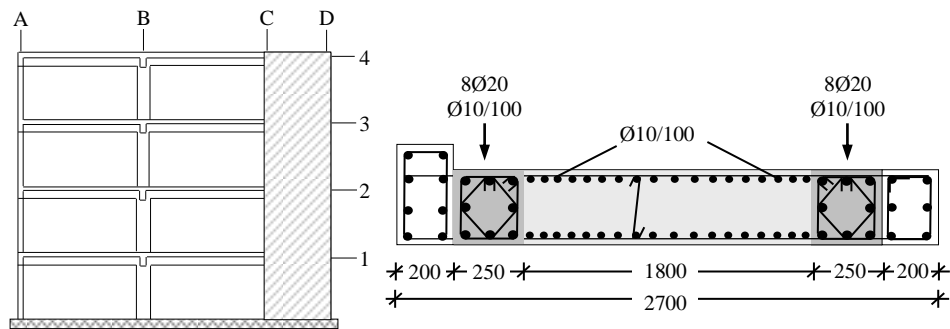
Configuration of the retrofitted frame and cross-sectional detailing of the infill wall.
